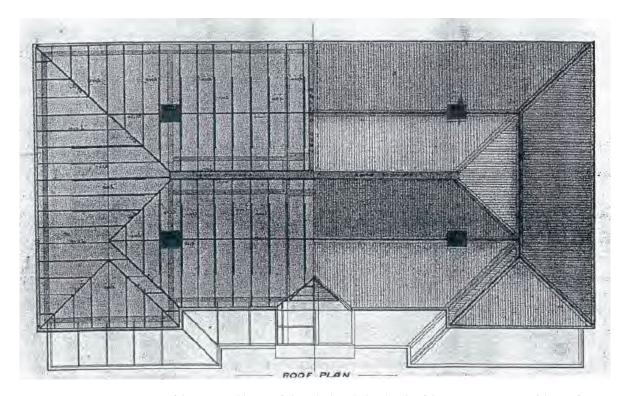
1887 construction of the CME Building roof plan which includes details of the cut-away section of the roof truss timbers. Source: Rappaport & Caldis Cook Group, 1997.
